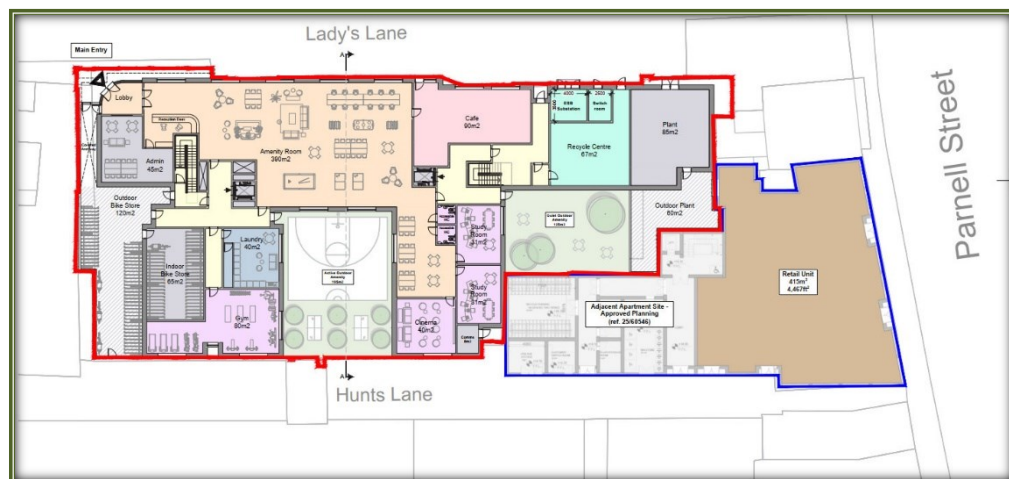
Extract from Planning Drawings, Ground Floor Plan (as prepared by JFA Architects)
